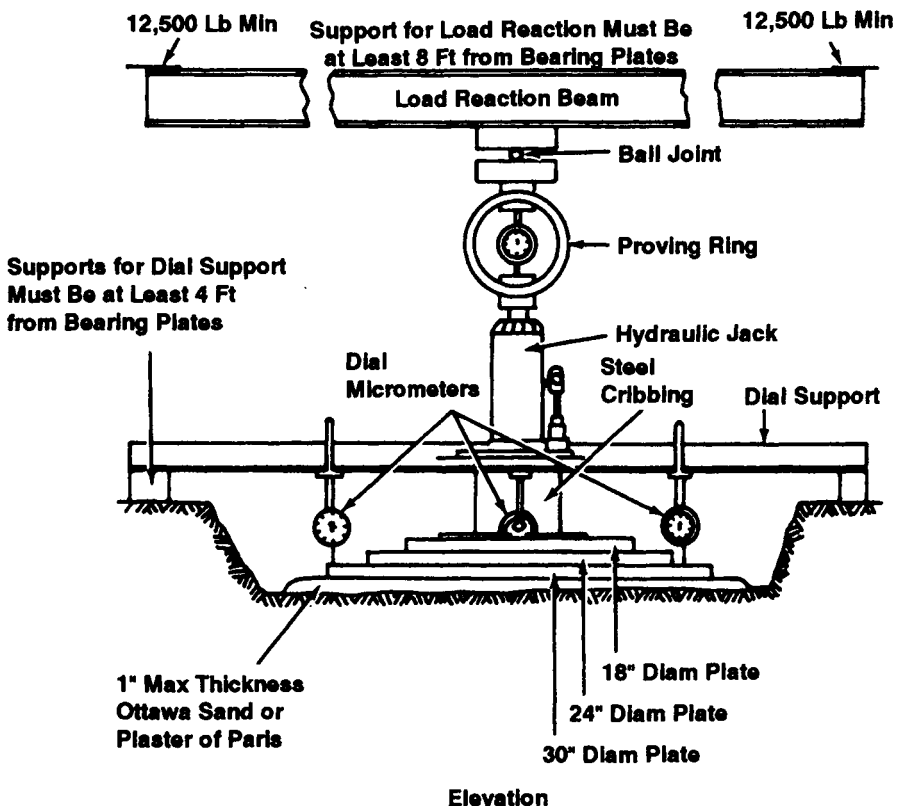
Plate Bearing Test Loading (Department of the Army 1987).
